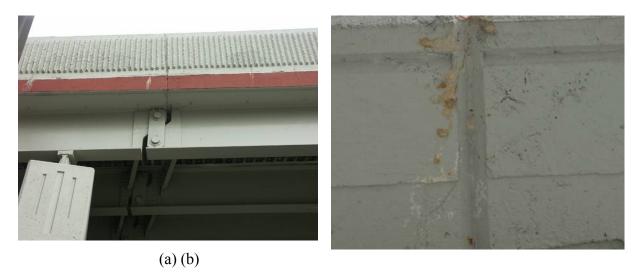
(a) Bridge deck underside and (b) link slab underside
